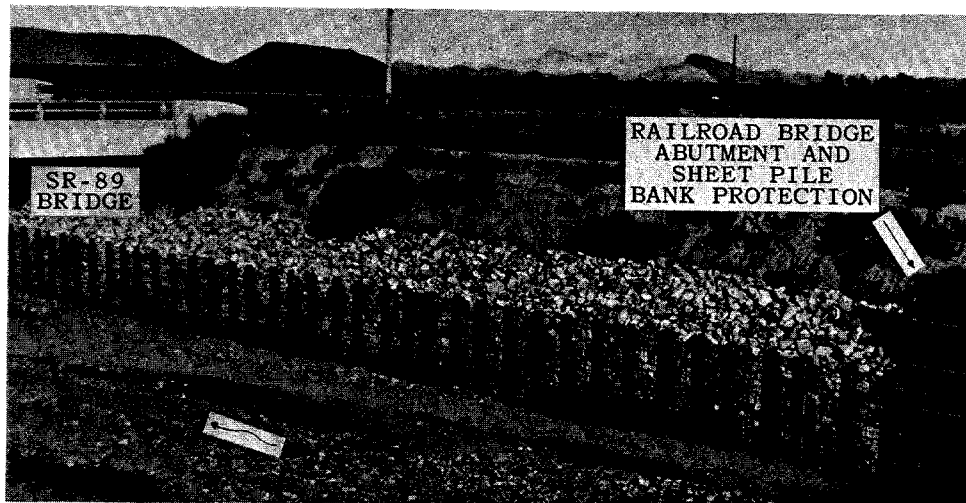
"Railbank" revetment at right bank, installed in 1973, as photographed in November 1977, after floods of 1974 and 1977.
